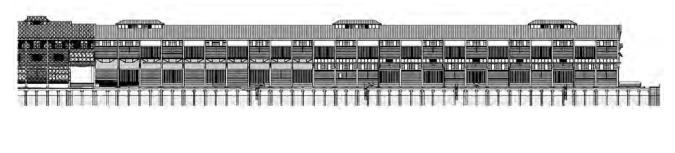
Existing and proposed east elevation to Pier 2/3 (proposed alterations shown in blue)
